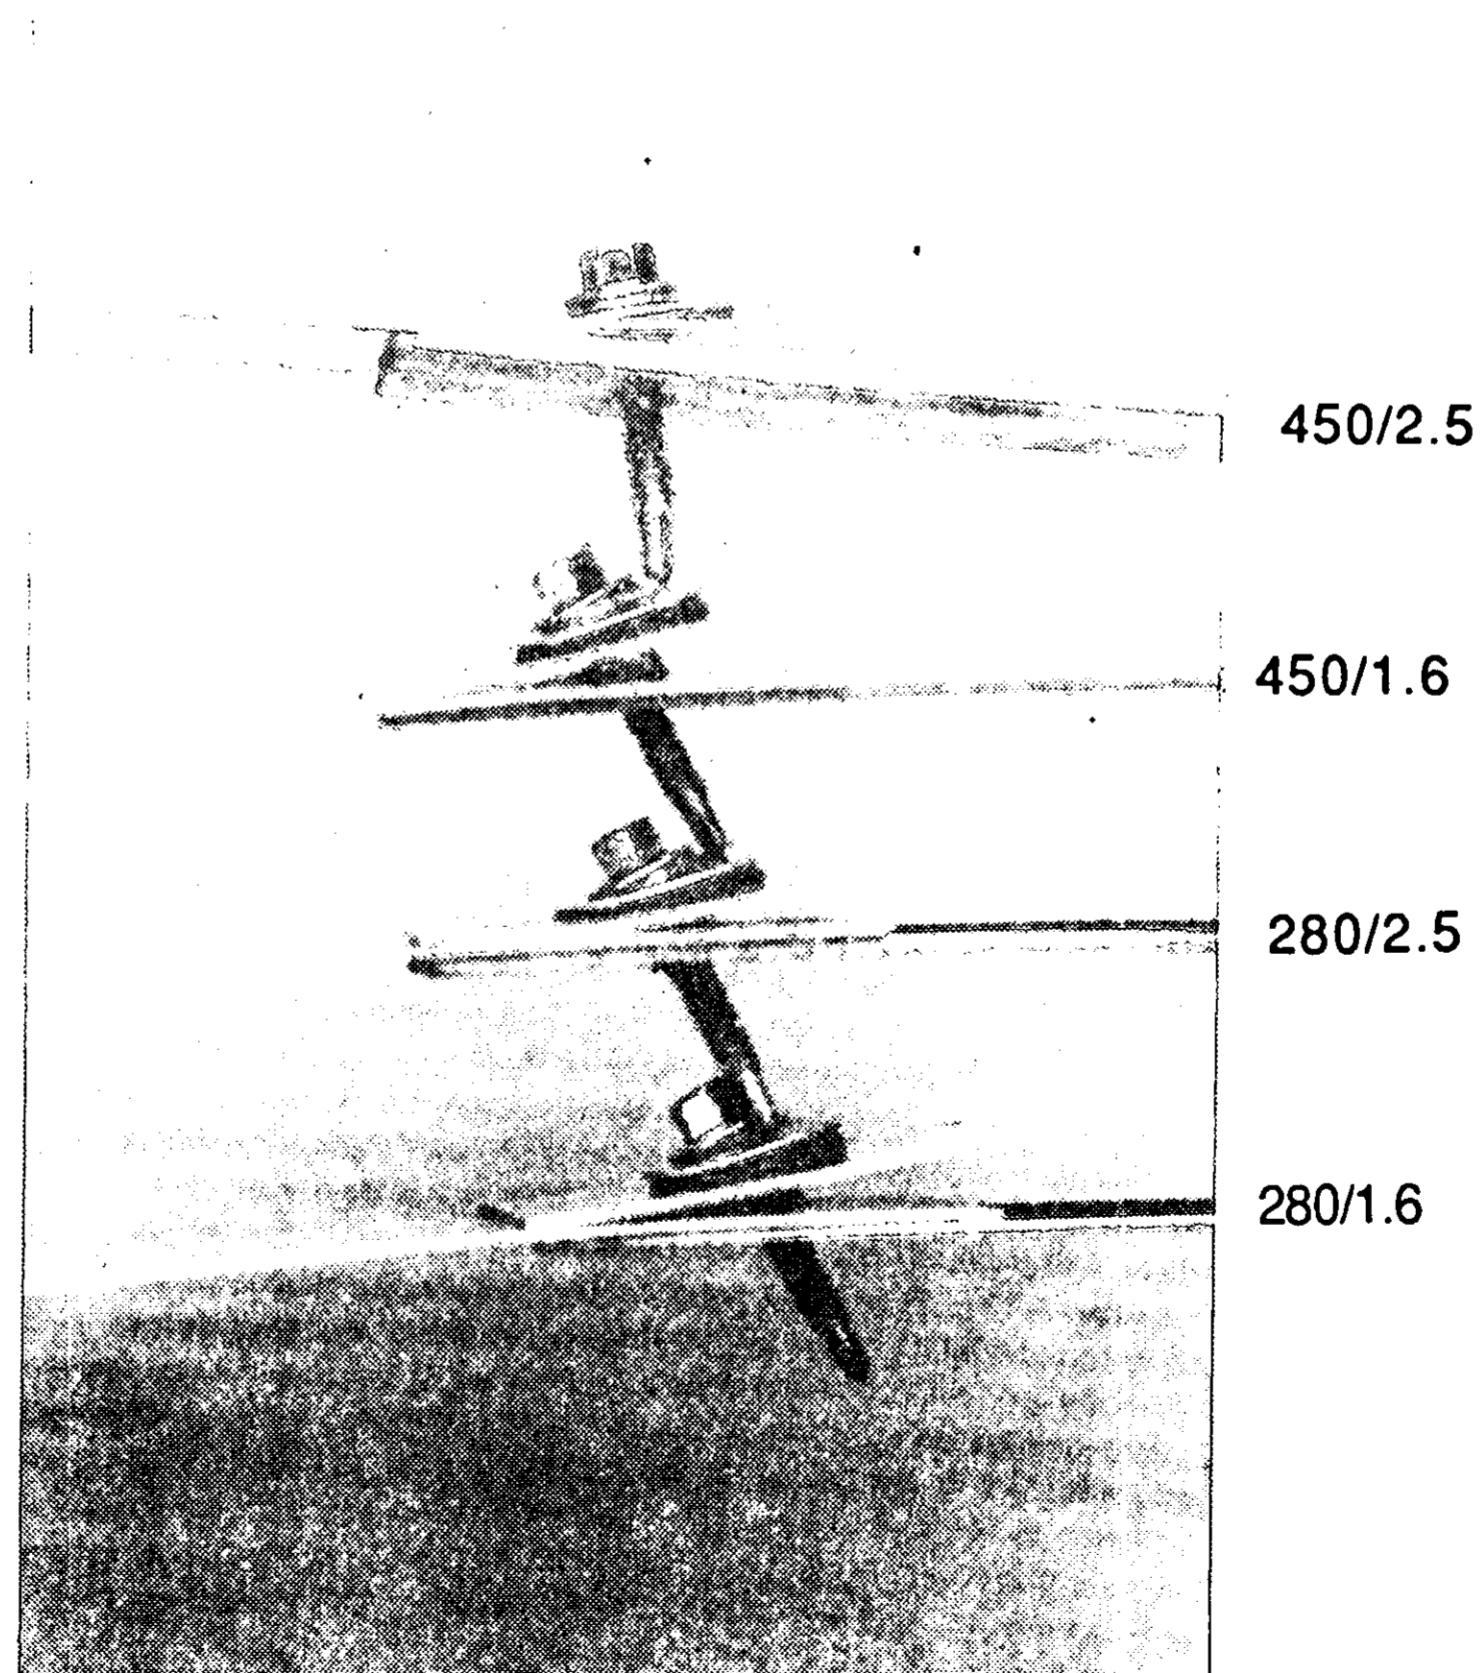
Sheet (0.55 mm)-to-purlin connections (12g emb) after pull-out tests.
